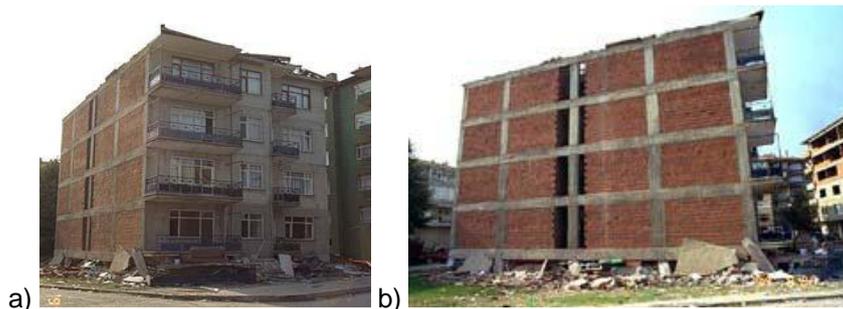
Views from a collapsed apartment building in Golcuk: (a) view of front facade of building; (b) view of infill wall perpendicular to sidewalk
